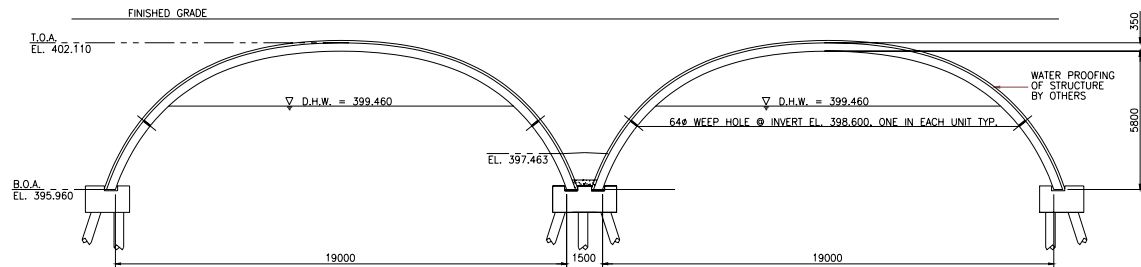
Elevation Drawing TechSpan Arch Structure on Pile Foundation
